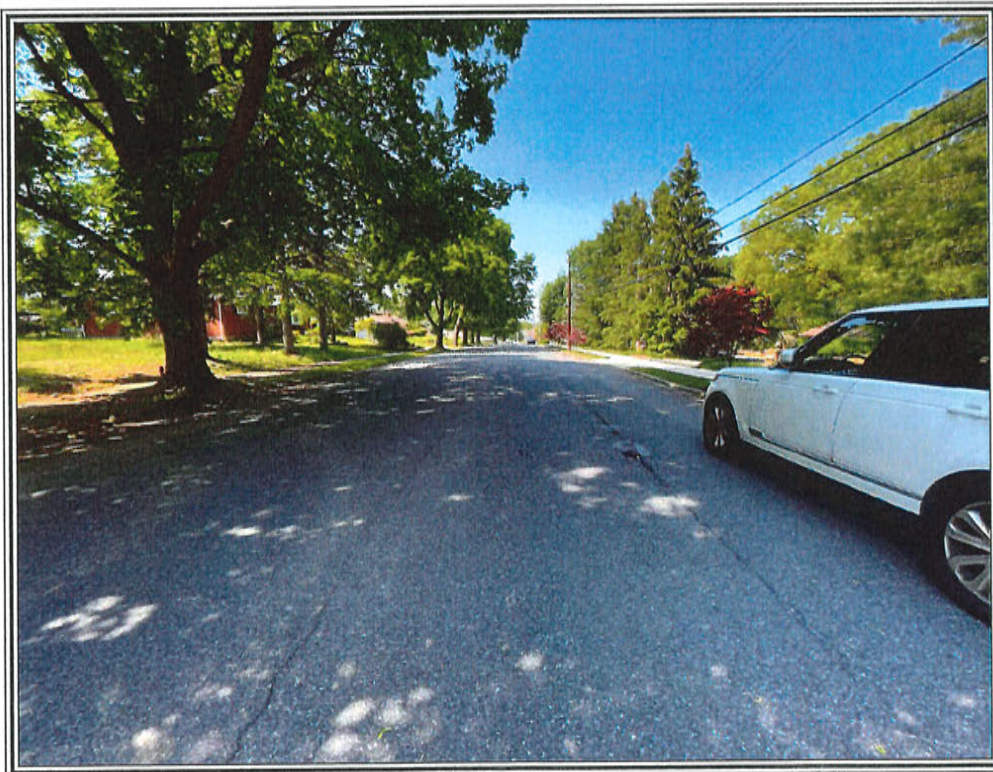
LOOKING NORTH ON KELCHNER ROAD
